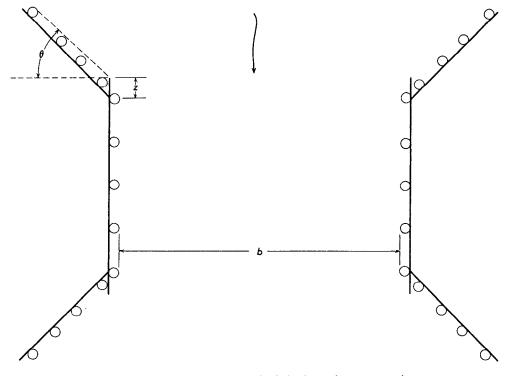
Definition sketch of timber-and-pile bridge with projecting abutments.
